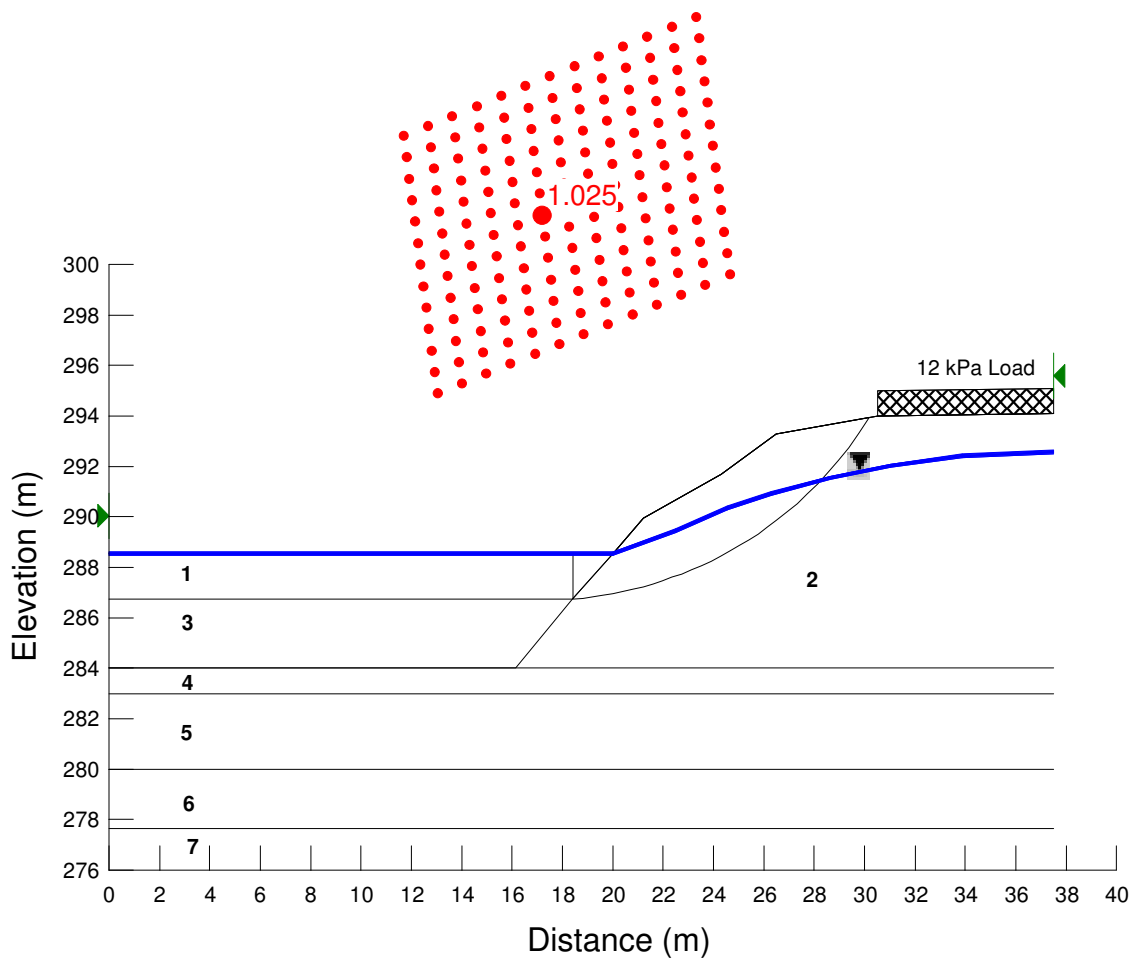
Stability of HWY11 Road Section at Sta. 14+800
